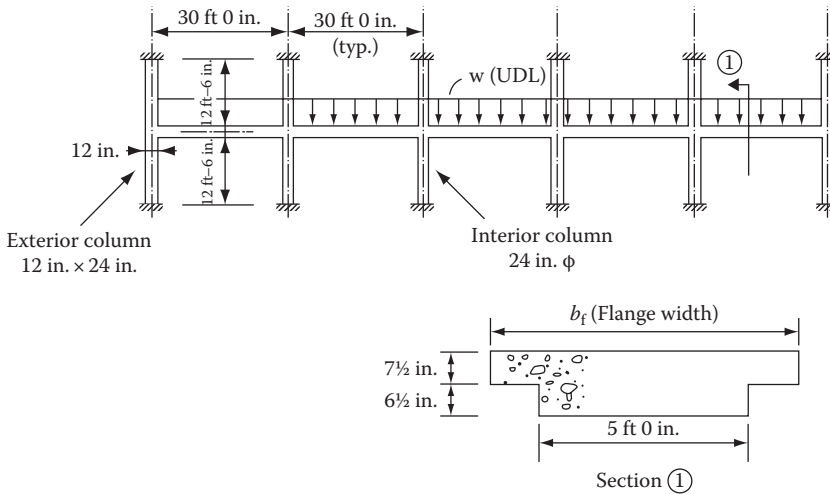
Example 2: post-tensioned continuous beam dimensions and loading.
